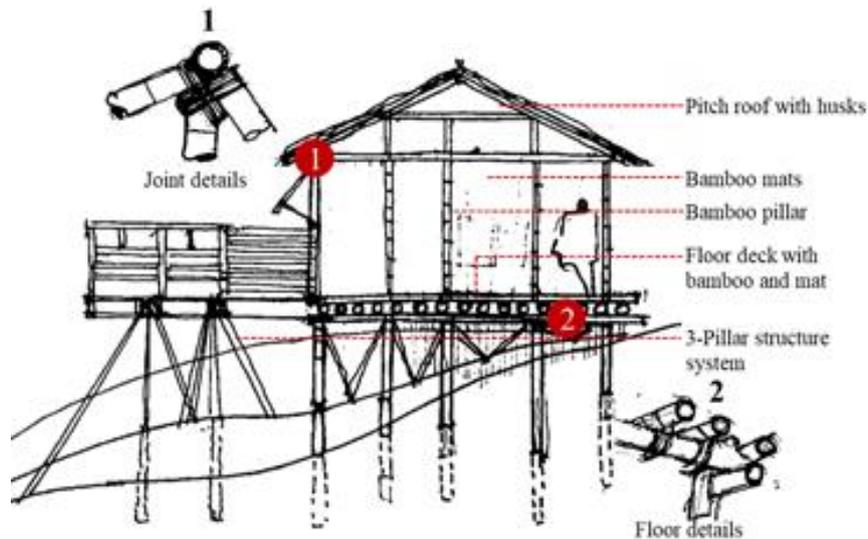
Mru Tribe's build form cross-section and details of joint (Drawn by author based on field survey, October 2021).
